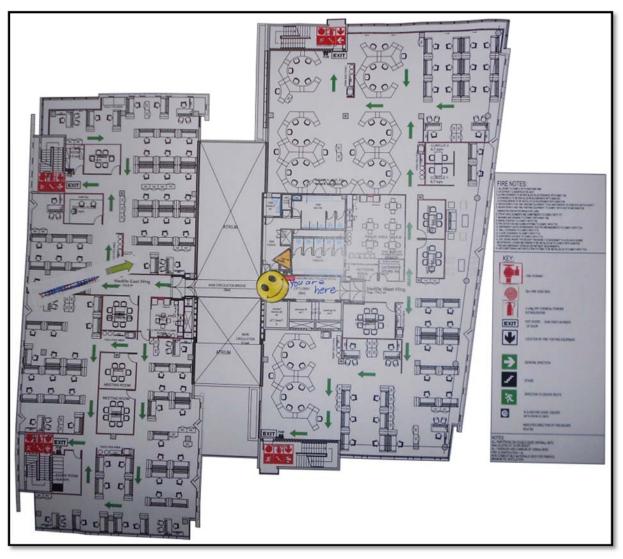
First Floor Plan of the Nedbank Ridgeview building (Source by Author)
